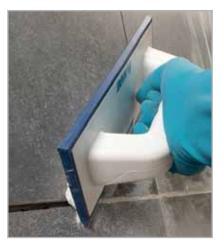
Grouting the tile joints on a wall with FLEXCOLOR
